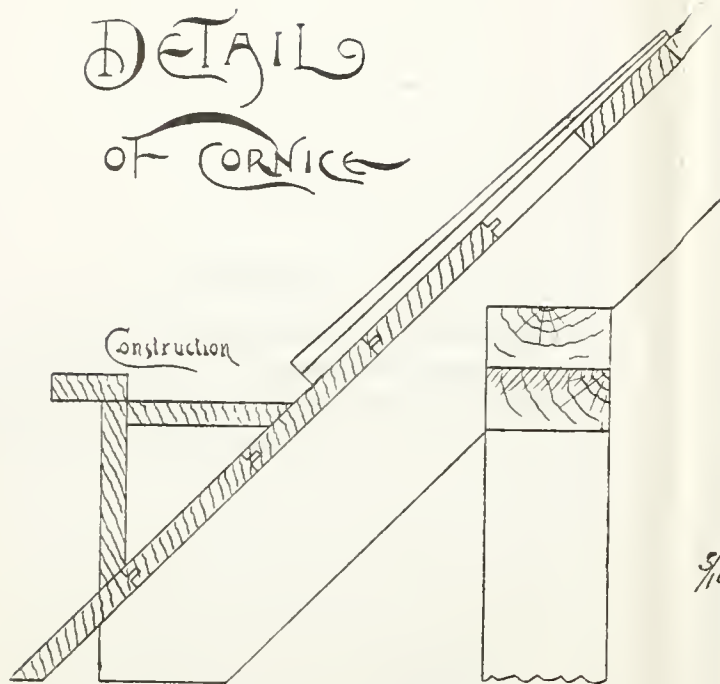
exhibits a portion of cornice and roof of main building. This shows the construction, with roof boards and shingles, also the finished portion of roof and cornice.
